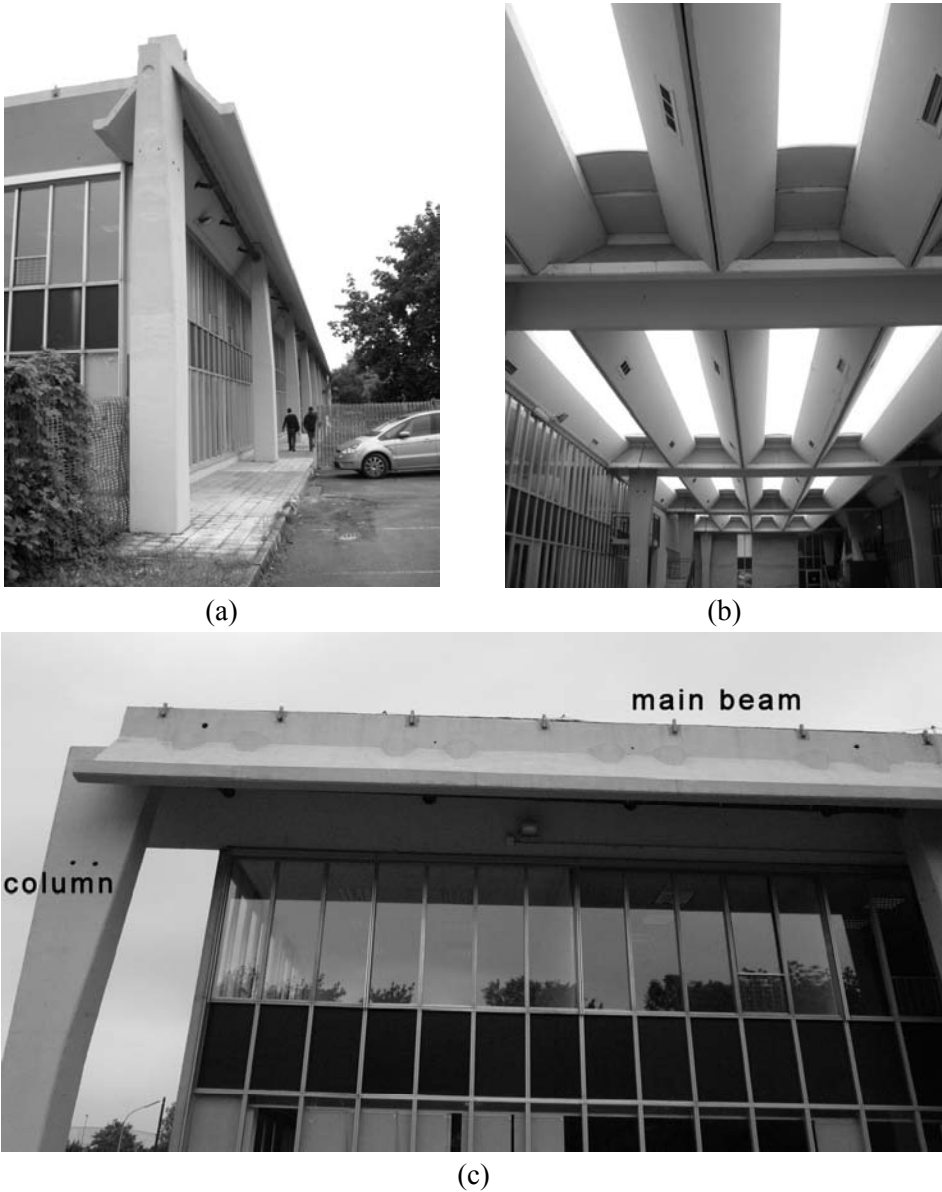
(a,c) Views of a typical prefabricated roof with external inverted-V main beams resting on tapered columns; and (b) internal V beams.
